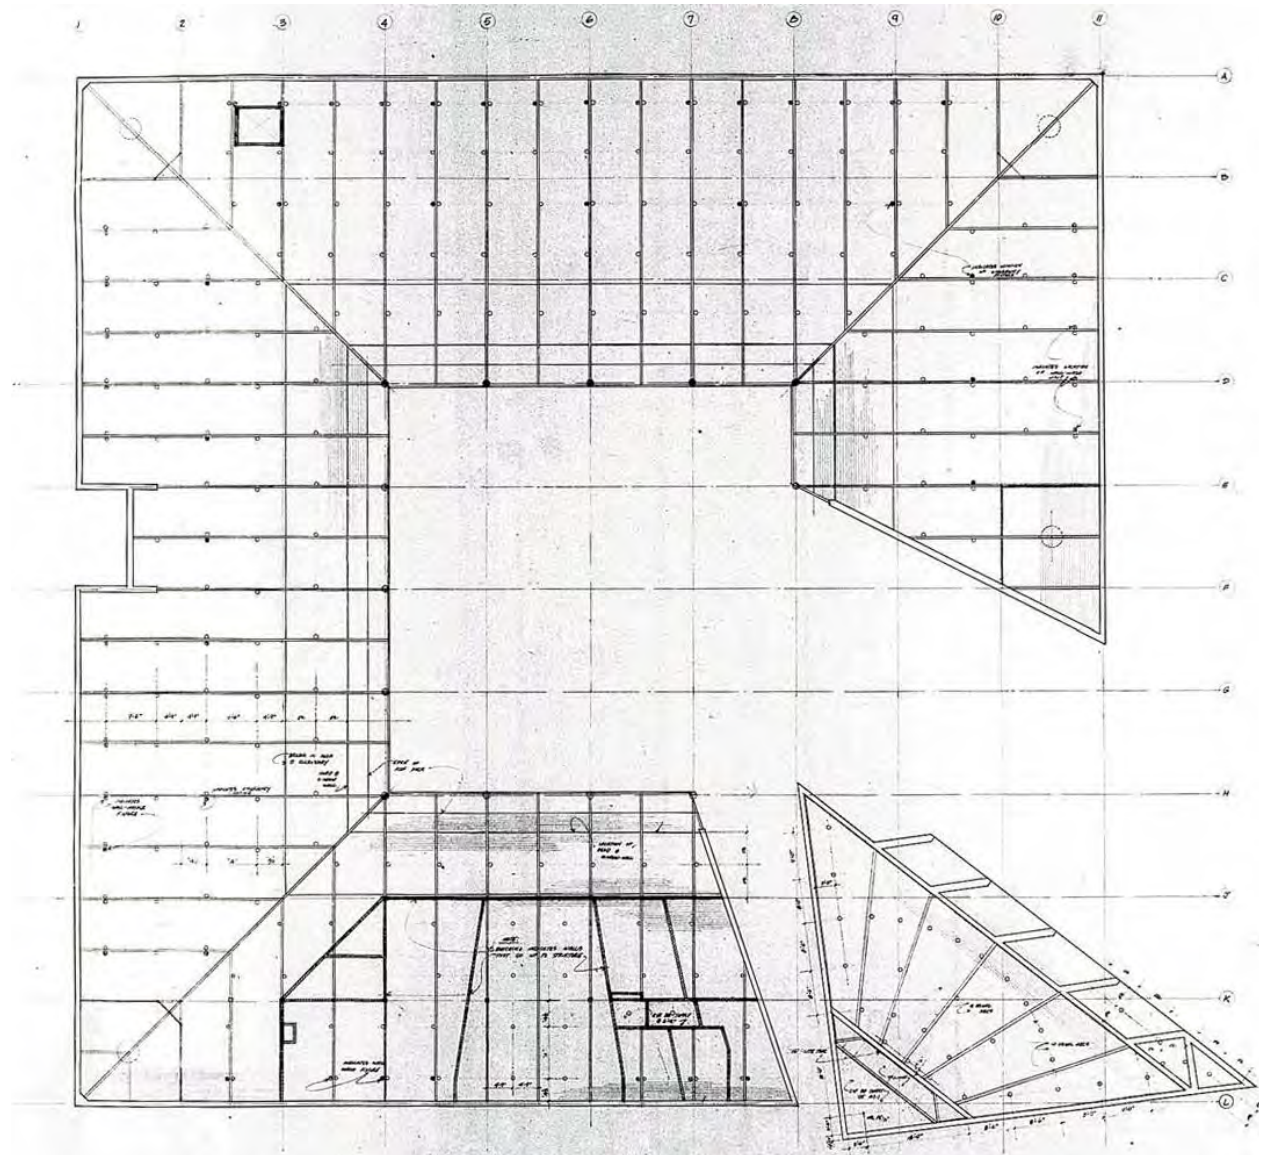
Overall roof plan of the building. The plan is oriented such that North is to the right. The Council Chambers Annex is triangular plan at the lower right portion of the plan.
